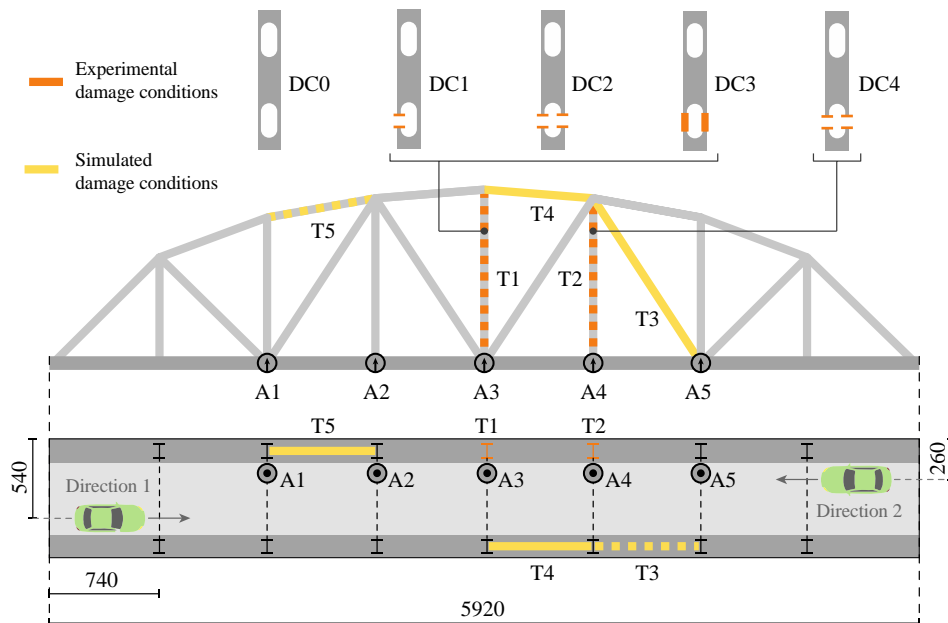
Scheme of the case study, sensor layout, and damage configurations; adapted from [42], units in cm.
